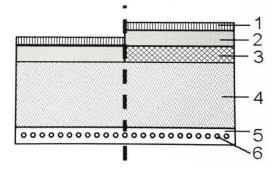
TABS F with and without acoustic insulation: 1 = floor covering, 2 = screed material, 3 = acoustic insulation, 4 = building structure, 5 = plastic micro pipes, 6 = plaster or gypsum (2)
